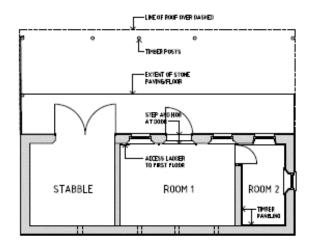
Stable. Existing Ground Floor Plan (Source: GB&A 2012)
